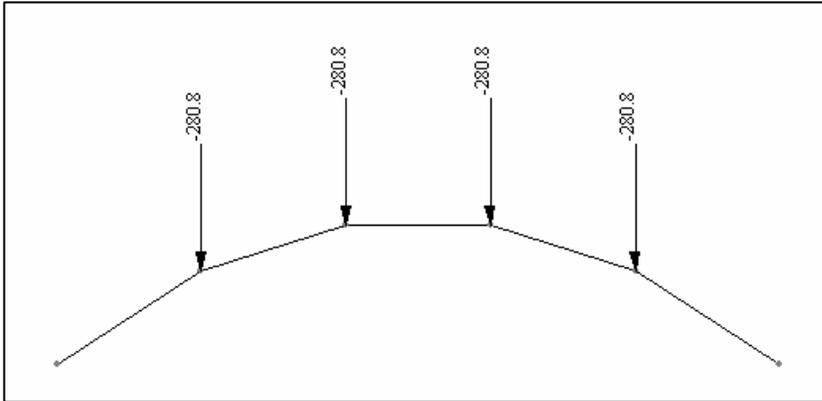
Superstructure dead load (in kips) on Arch One. The same loads are applied to parabolic arches Two through Five.
